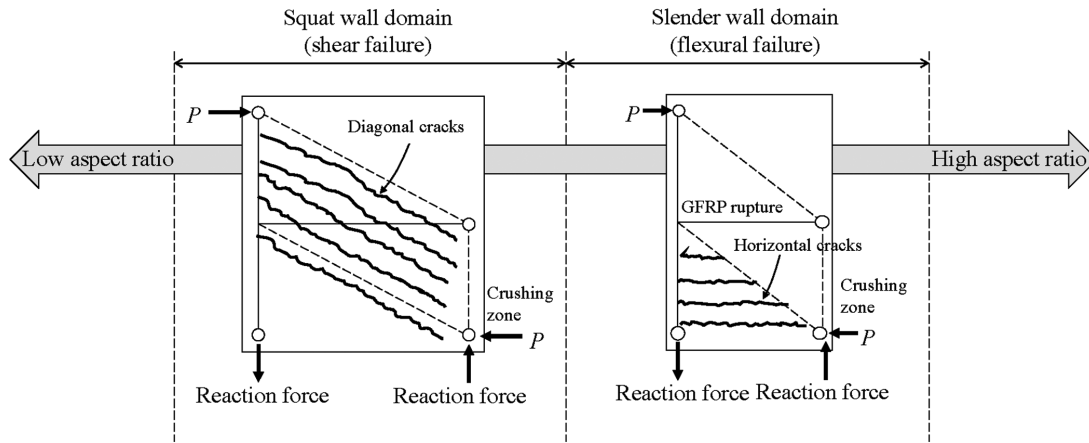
Conceptual failure modes of GFRP-reinforced concrete walls.
